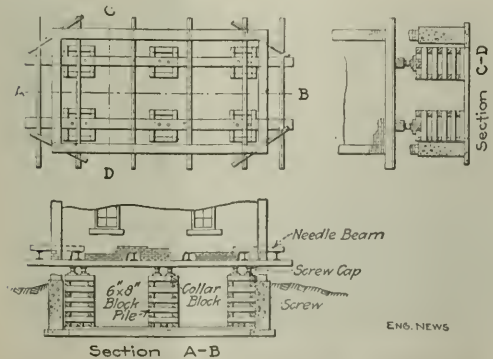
ARRANGEMENT OF BLOCKING, TIMBERS AND SCREWS FOR RAISING A BUILDING
